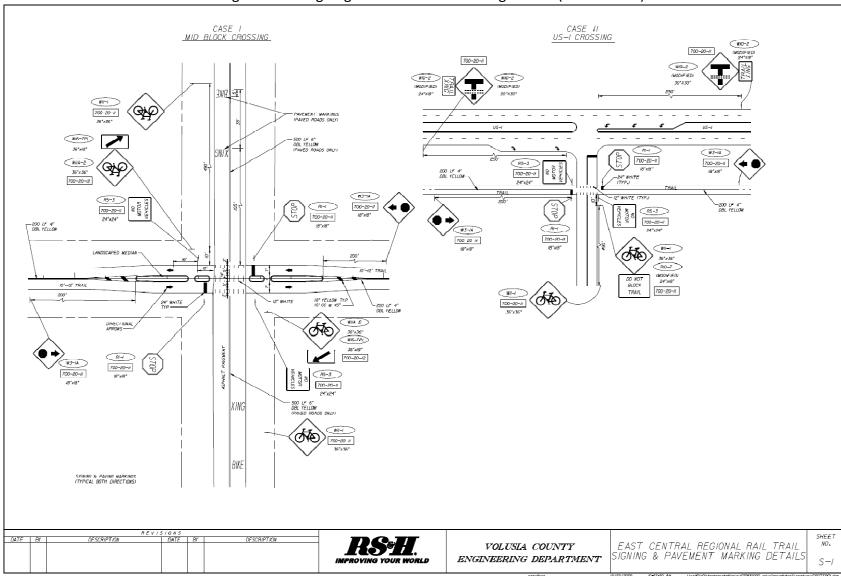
Signing and Pavement Marking Details (Sheet 1 of 2)
